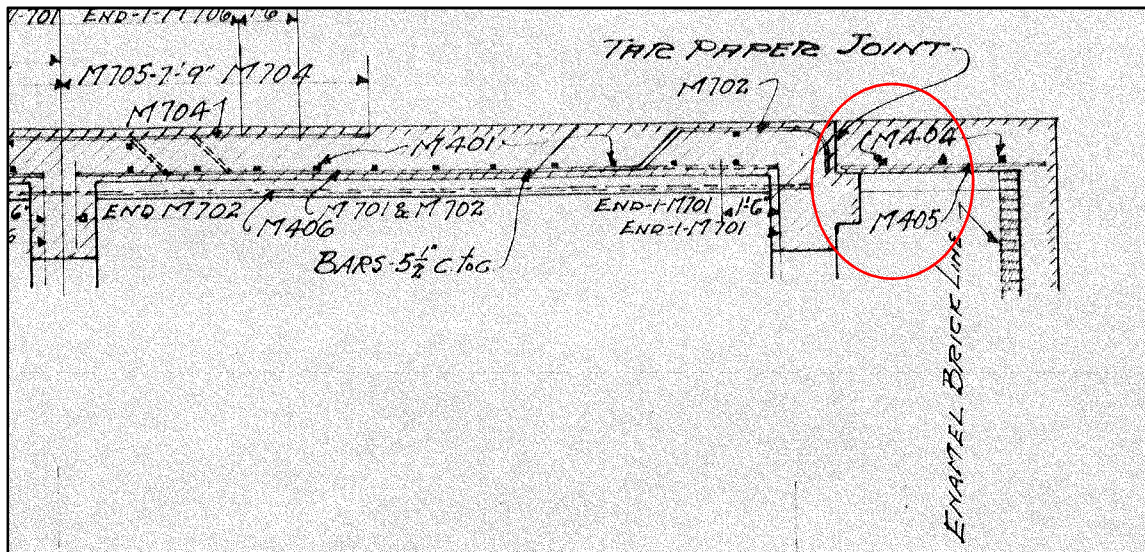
Longitudinal Construction Joint (Circled, referenced as Tar Paper Joint), Above Line A North Face, Original Construction Drawing No. A2246.
